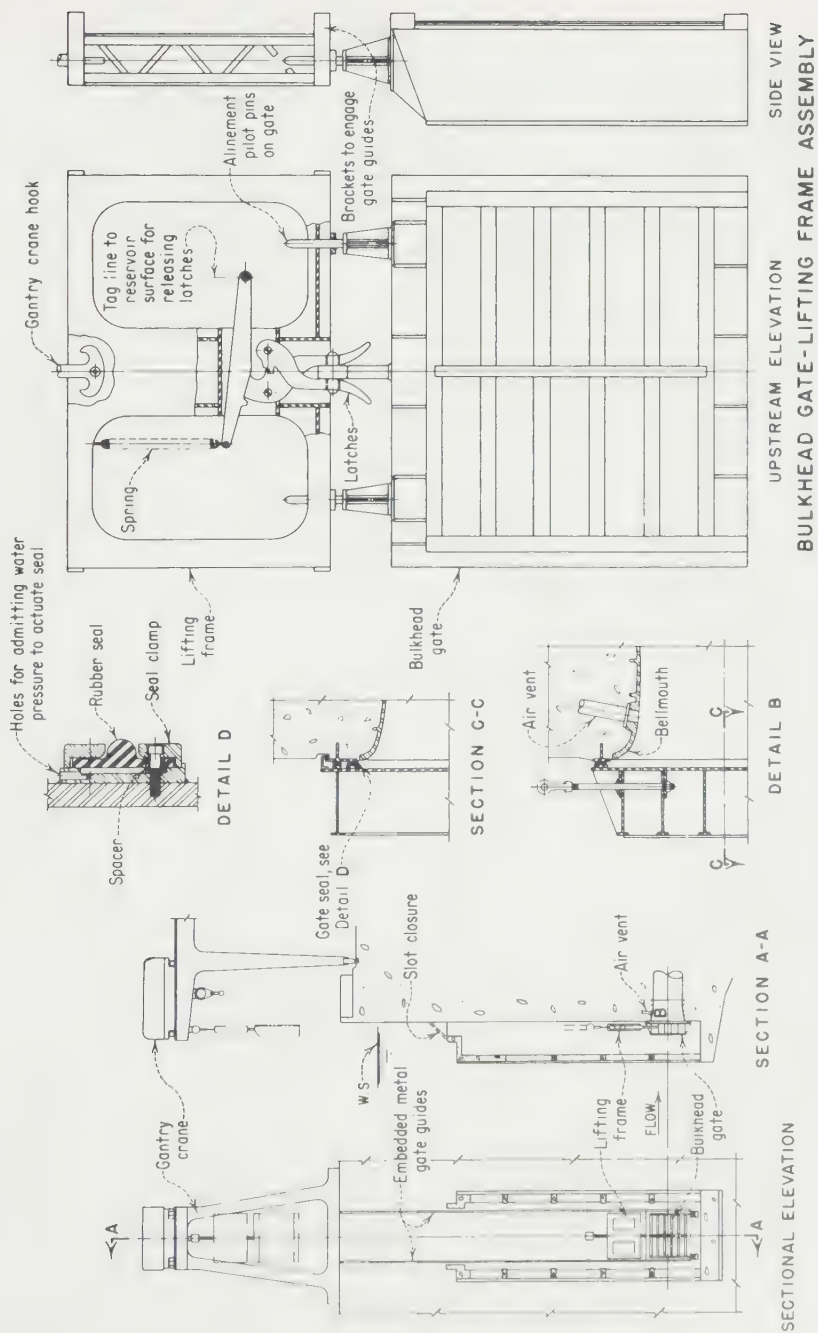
Typical bulkhead installation and lifting-frame arrangement.
